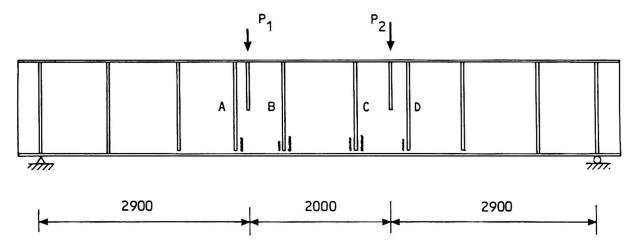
Plate girder; fatigue cracking at lower ends of stiffeners A-D.
